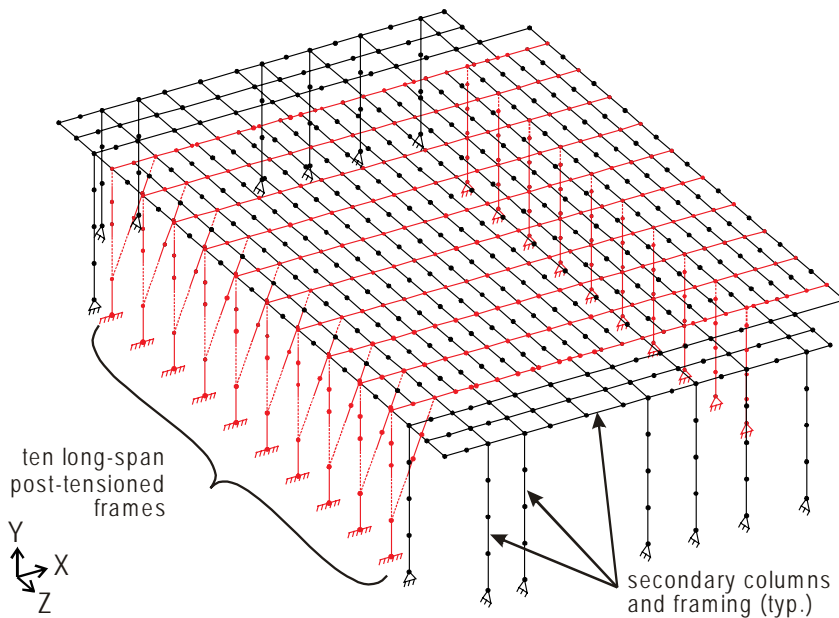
Isometric view of the structural model used for vibration analyses. Long-span frames are highlighted in red
